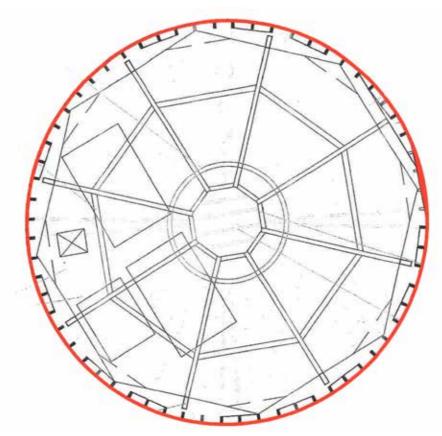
Wall boarding (H) in plan view (2019) © H&R (SLHA edit)
